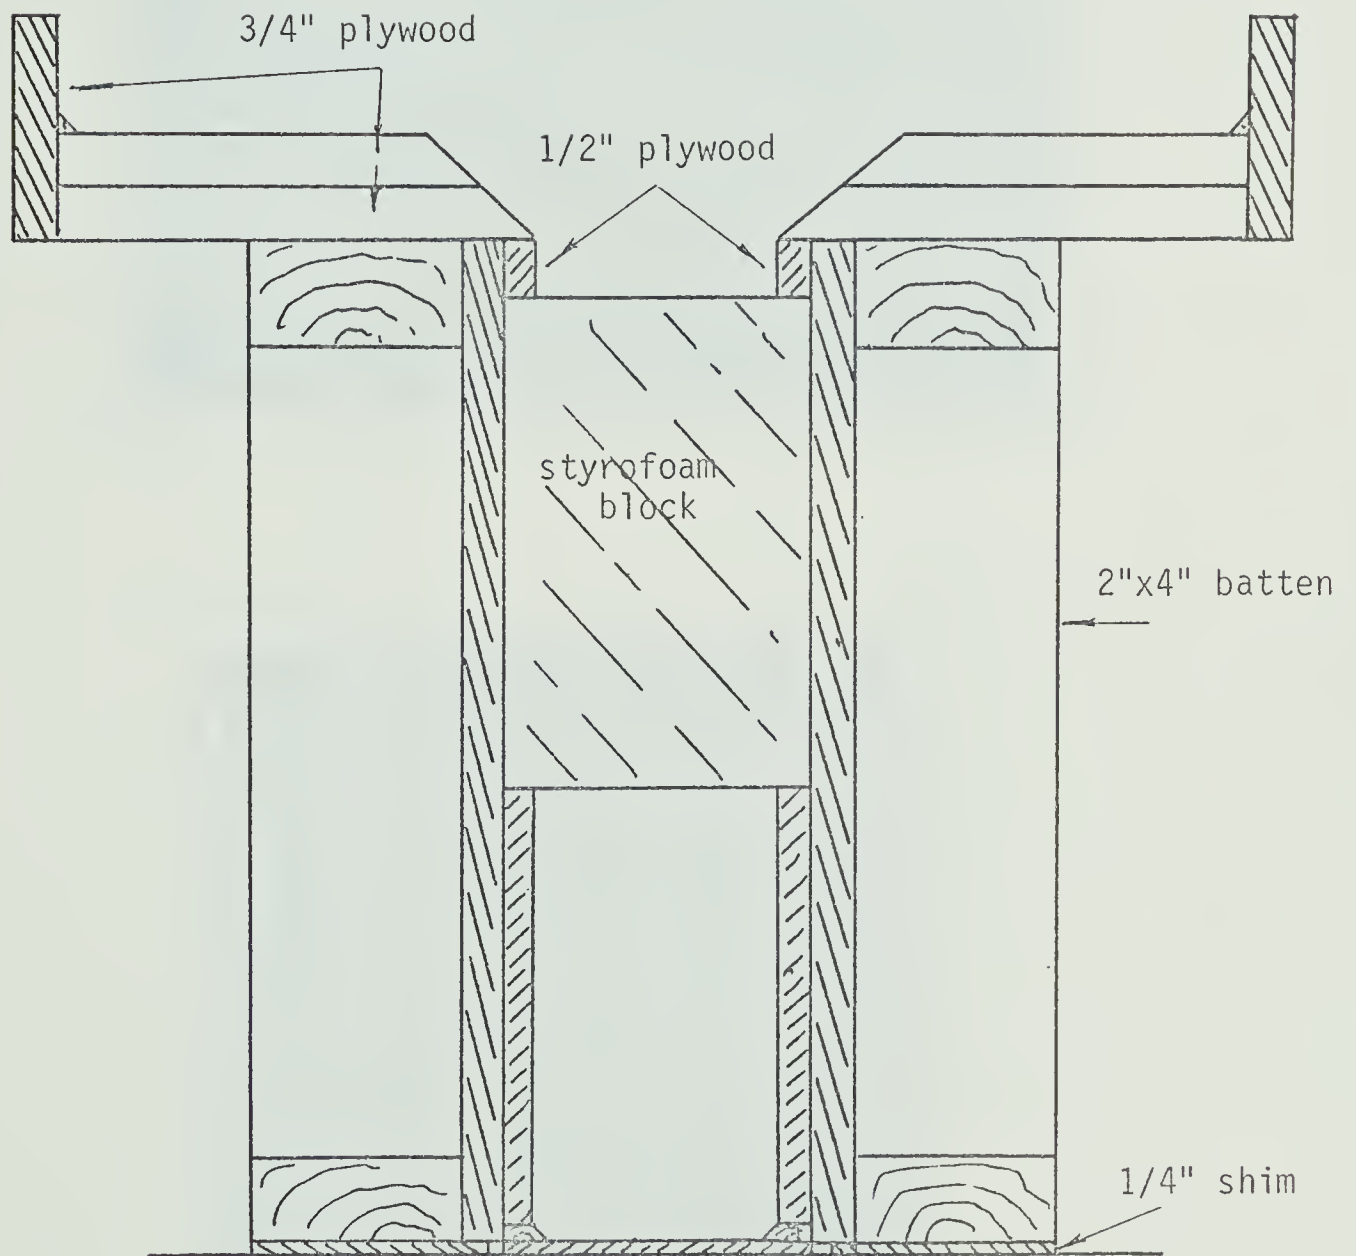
TYPICAL X-SECTION THROUGH FORMWORK
